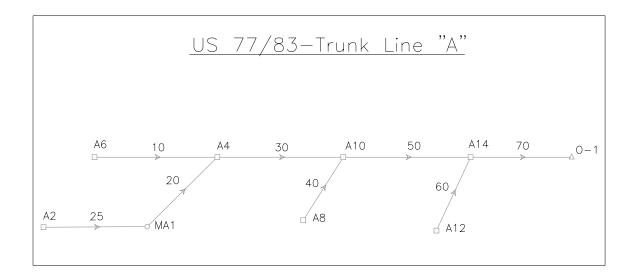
Layout of trunk line A of U.S. 77/83 under StormCAD.
